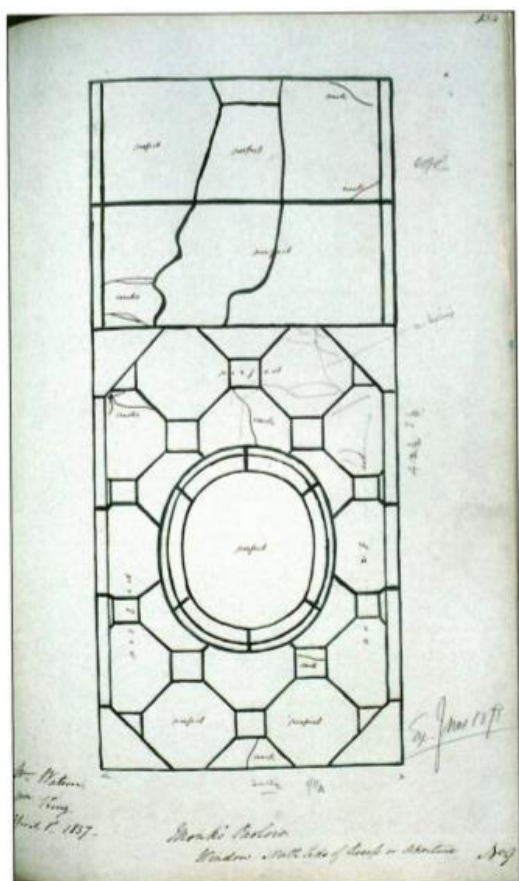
George Bailey, Plan of window on the north side of the recess/aperture, Monk's Parlour, John Soane's Museum (London), c. 1837.
